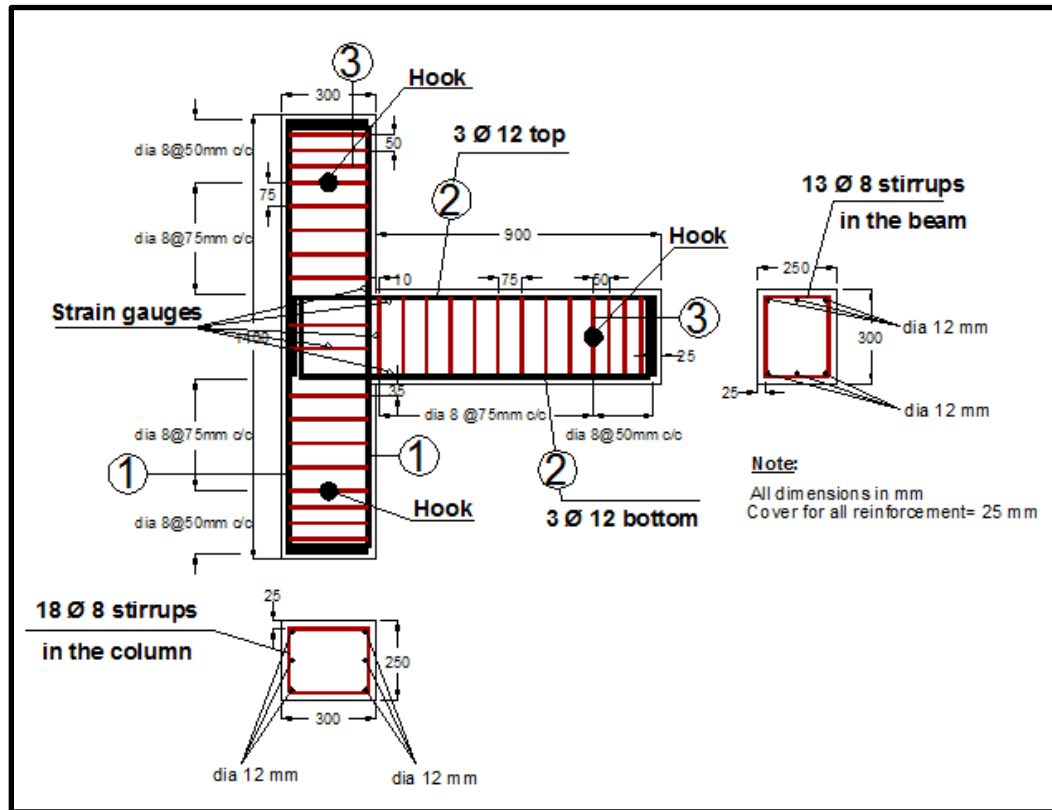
3: Geometry and reinforcement details of Con-BCJ-1, 2, and 3 specimens
